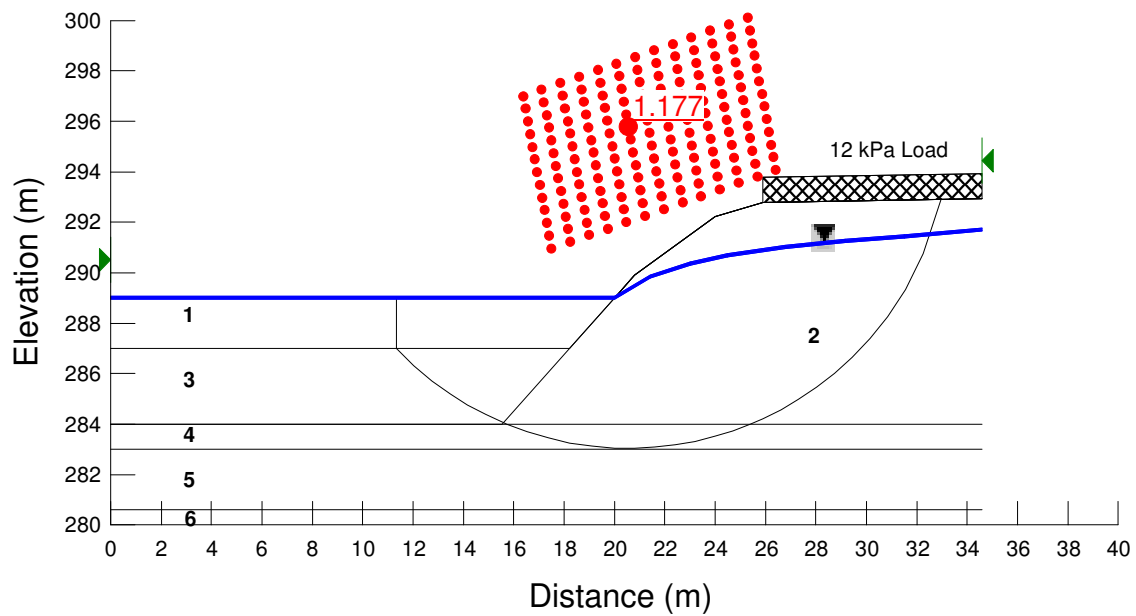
Stability of HWY11 Road Section at Sta. 14+850
